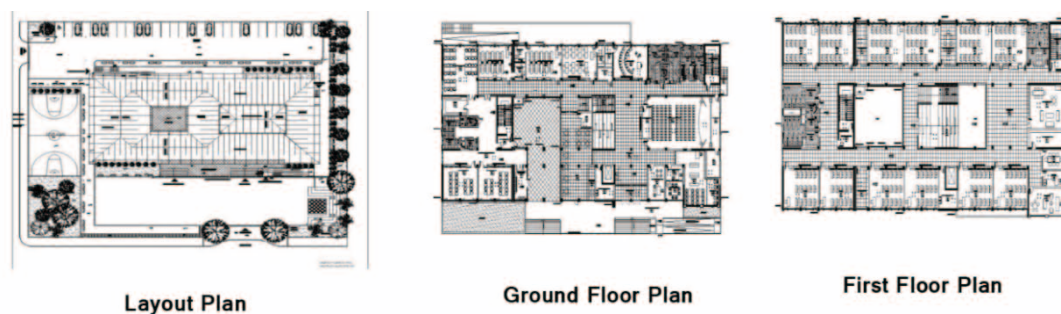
Floor plans of - Primary School with 12 Classroom - type project
